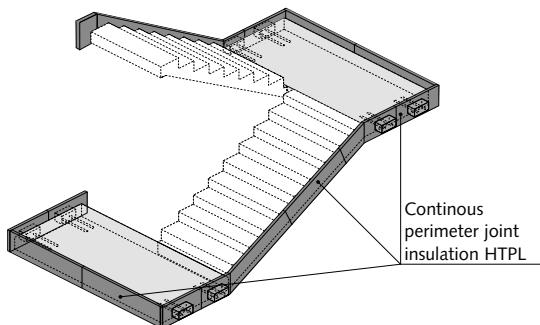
2.5 are design examples. The information provided by the structural engineer is always decisive.
